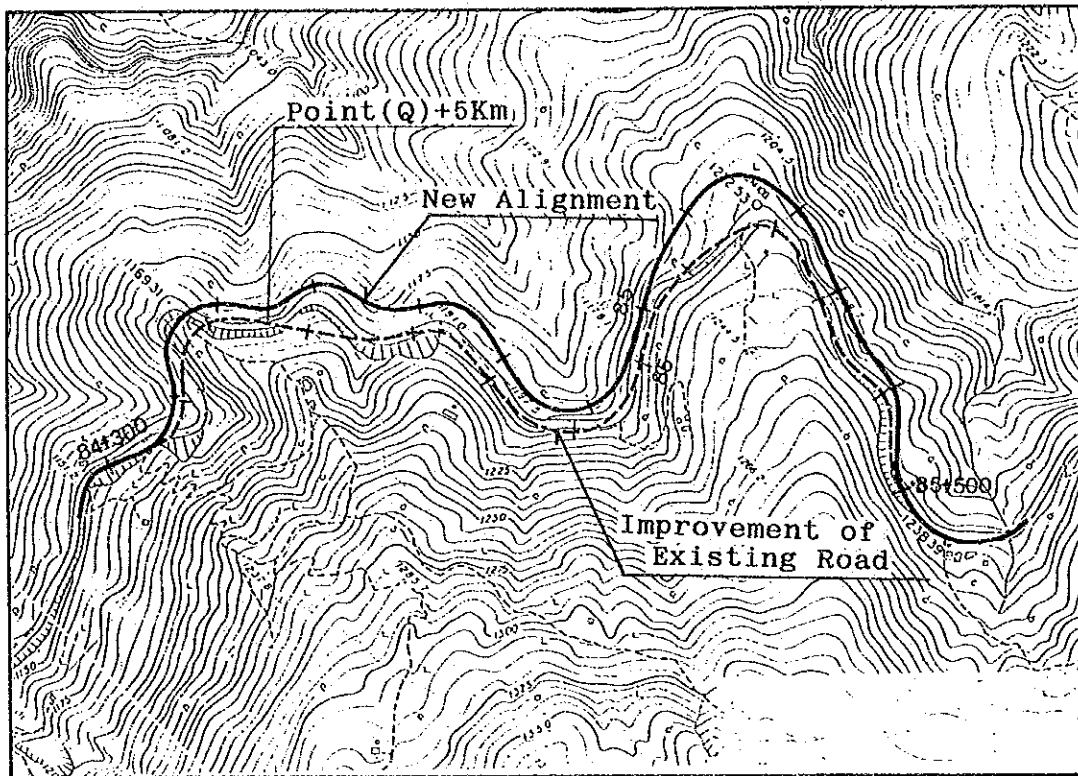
Plan of Alternatives at Point(Q)+5Km
